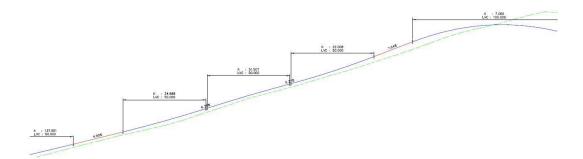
Vertical profile of non-corrugated pavement section (67+700 km)
